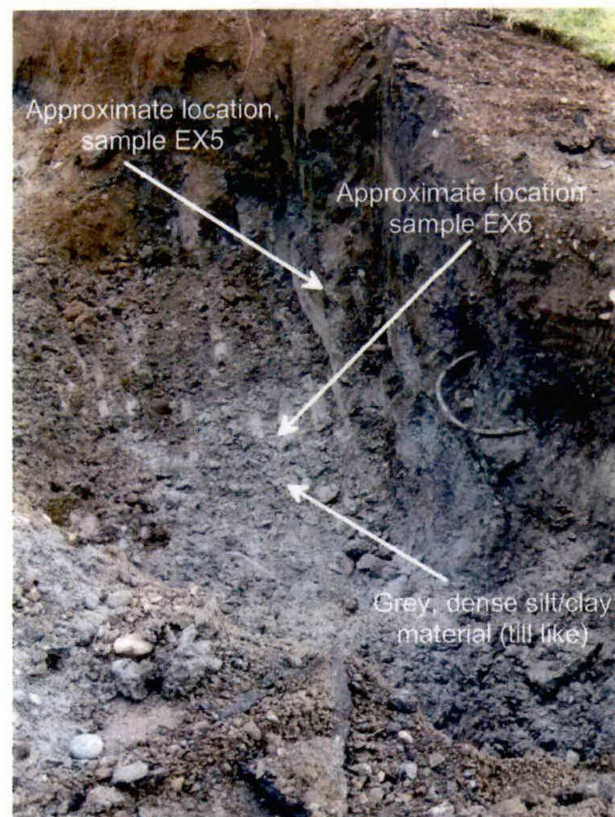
Example of grey dense silt/clay material consistently encountered at base of excavation. Photo show area where samples EX5 and EX6 collected from.
